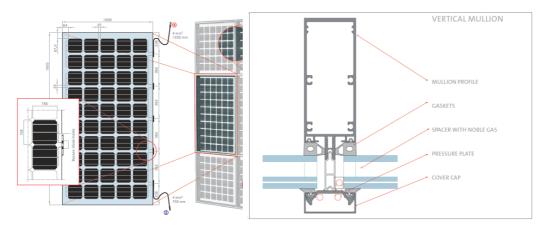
Details of a BIPV curtain wall façade [source: Sapa Group]
